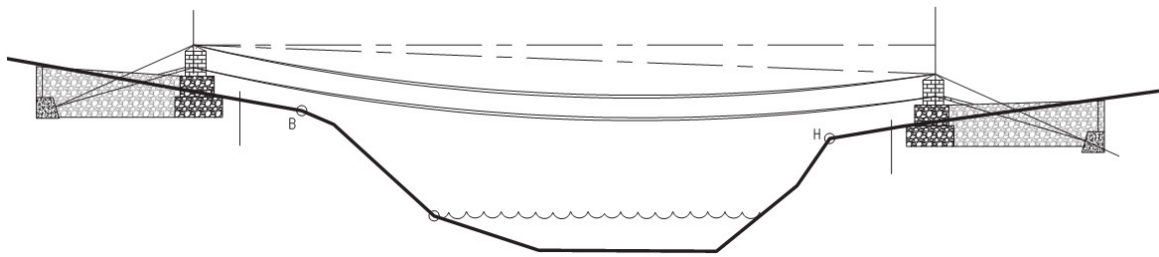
Typical Geometry of a B2P Suspended-Cable Footbridge (Bridges to Prosperity, 2016).
